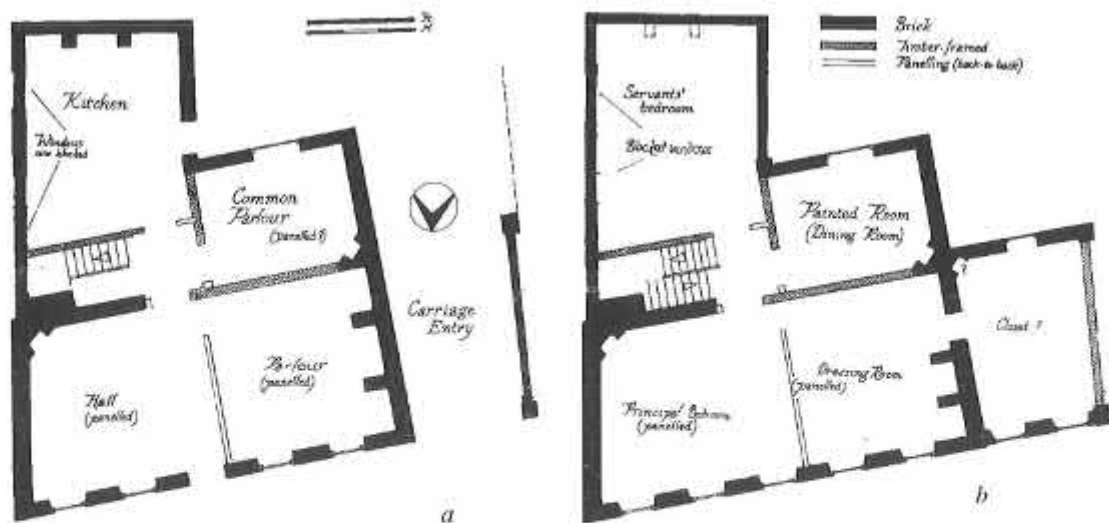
Reconstruction plan of Charles Eccles's house; (a) ground floor; (b) first floor (Room names conjectural)
